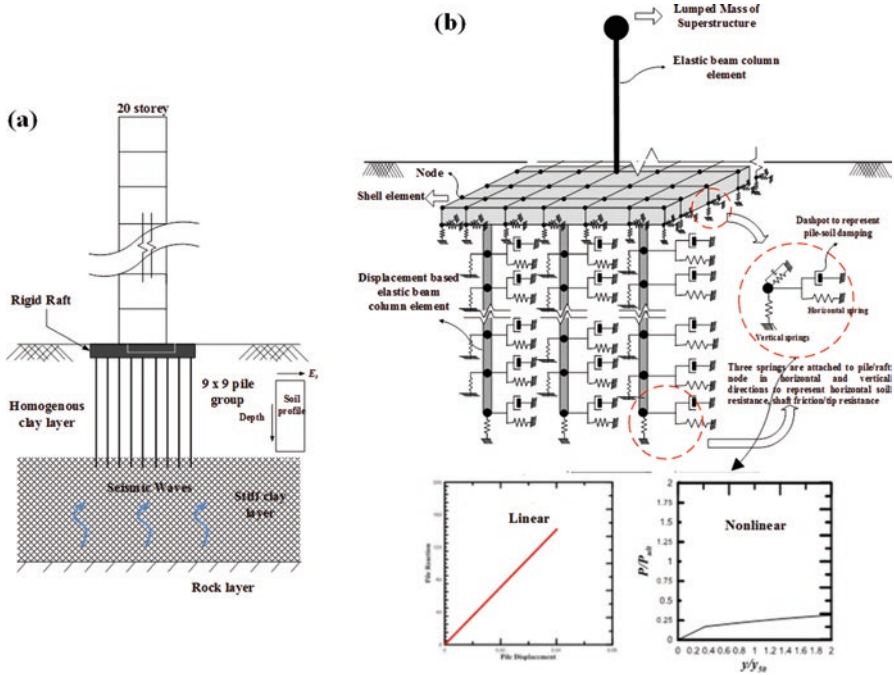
(a) Structural system and (b) finite element model of soil-piled raft-structure
